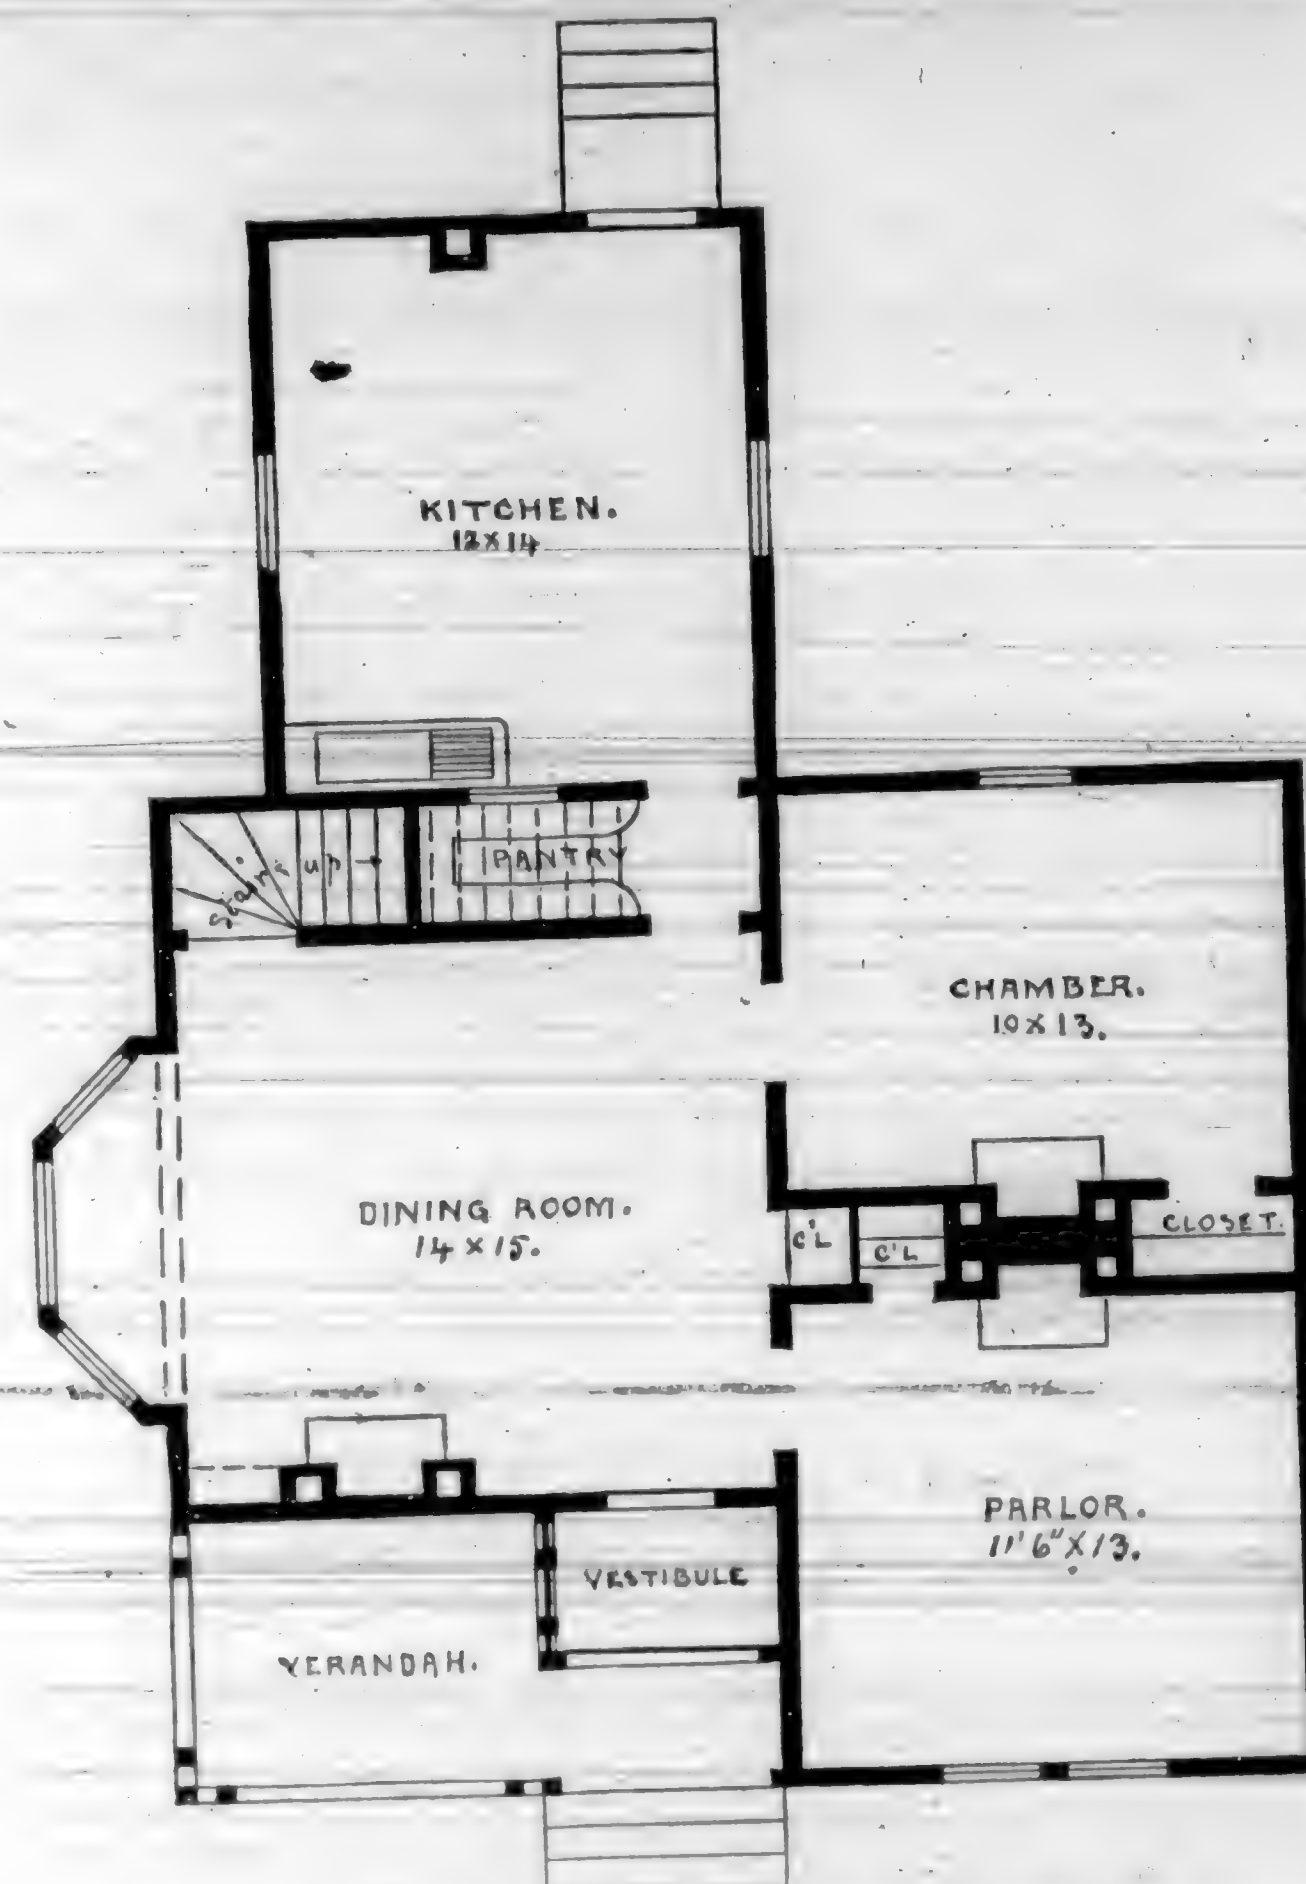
FIRST FLOOR PLAN \$3,000 DWELLING.
